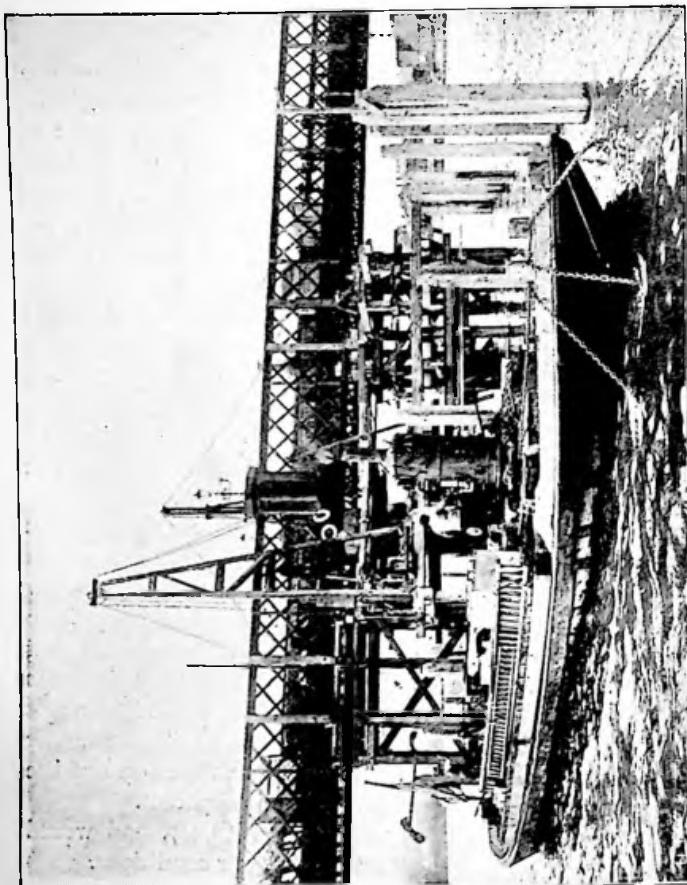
Wandsworth Bridge under Repair, 1912.
